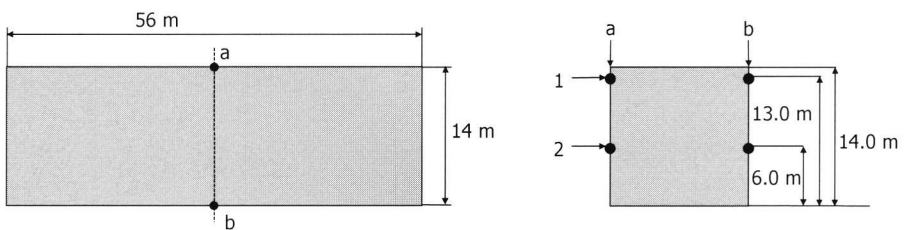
Top view of the central building (left) and vertical cross-section (right). Side a is directed to the built-up half of the turntable, whereas side b is directed to the void half. At the center of each side a set of 2 pressure sensors is placed in a vertical line. The positions of the 4 pressure sensors (1a, 1b, 2a, 2b) are marked (●).
